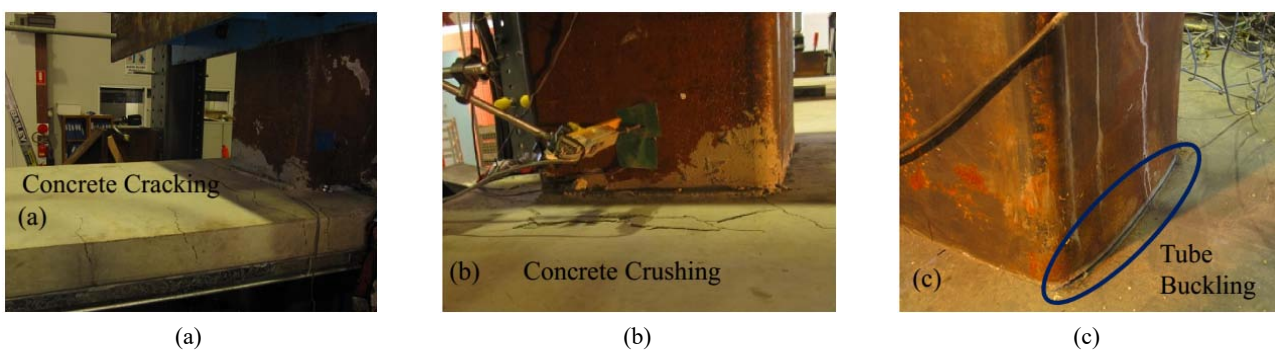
(a) Flexural cracking of the concrete slab near the connection; (b) Crushing of concrete in connection region; (c) steel tube buckling at the base under the ultimate load
